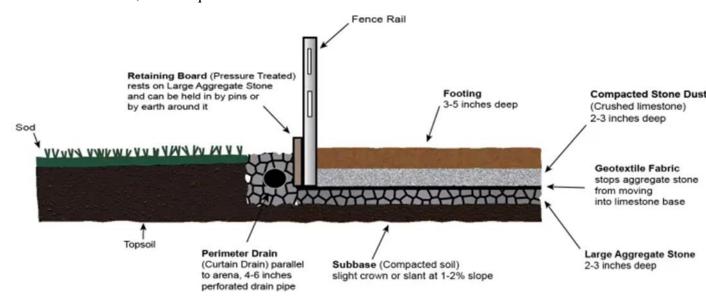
Example of the construction of an equestrian arena with fibres and footing
